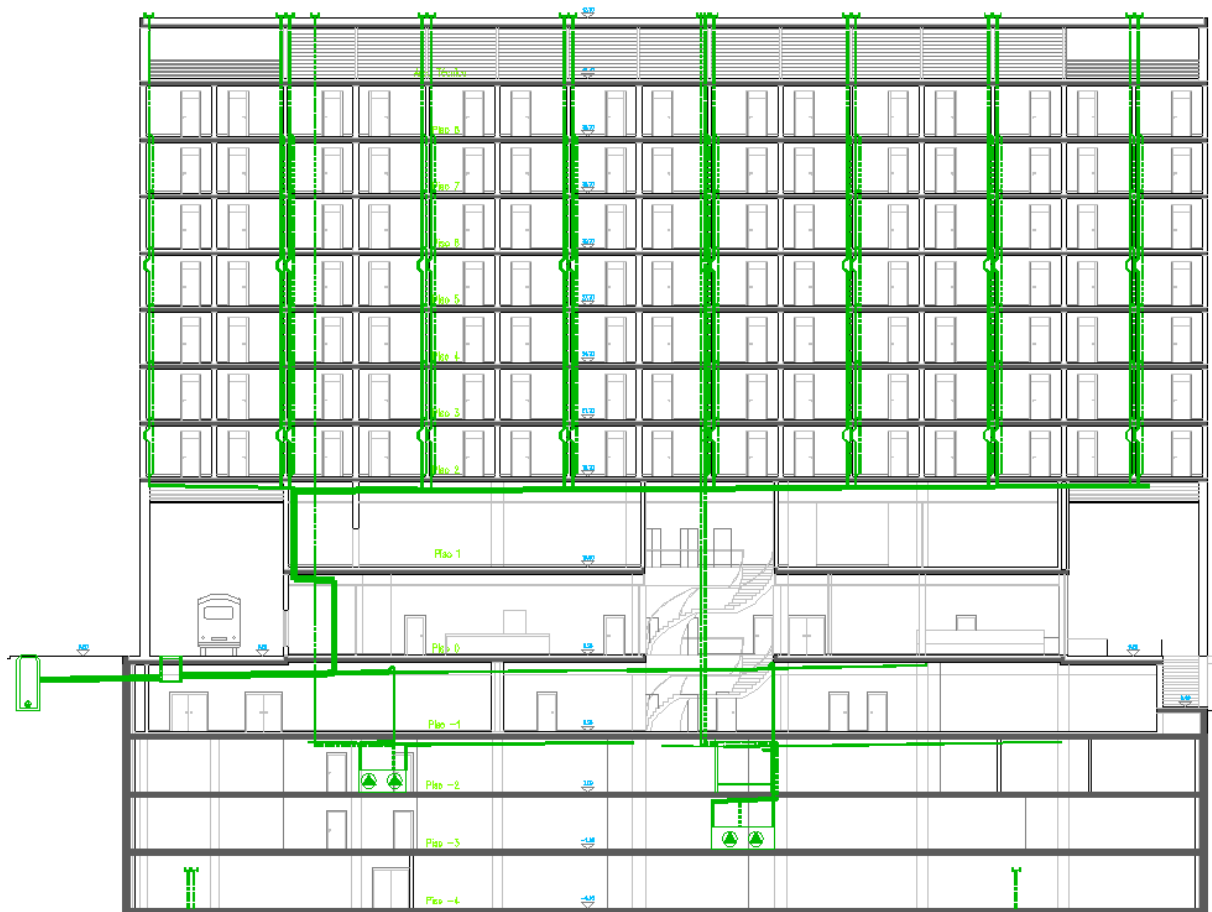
Hotel Olissipo cross section (domestic wastewater drainage network)
